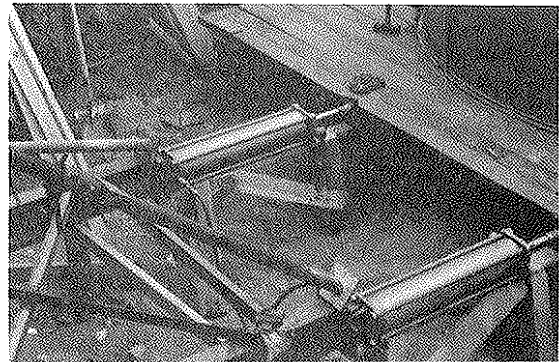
Jacking installation showing floor plate, custom fabricated 36-ton hydraulic jacks and push bar assembly.
